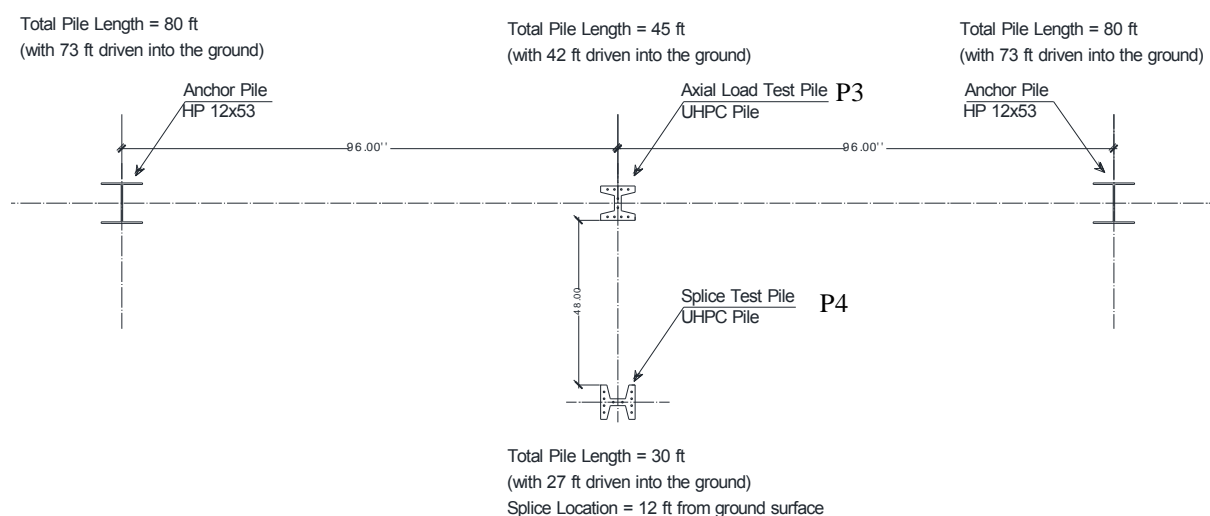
Location of Test Piles P3 and P4 in Plan View
